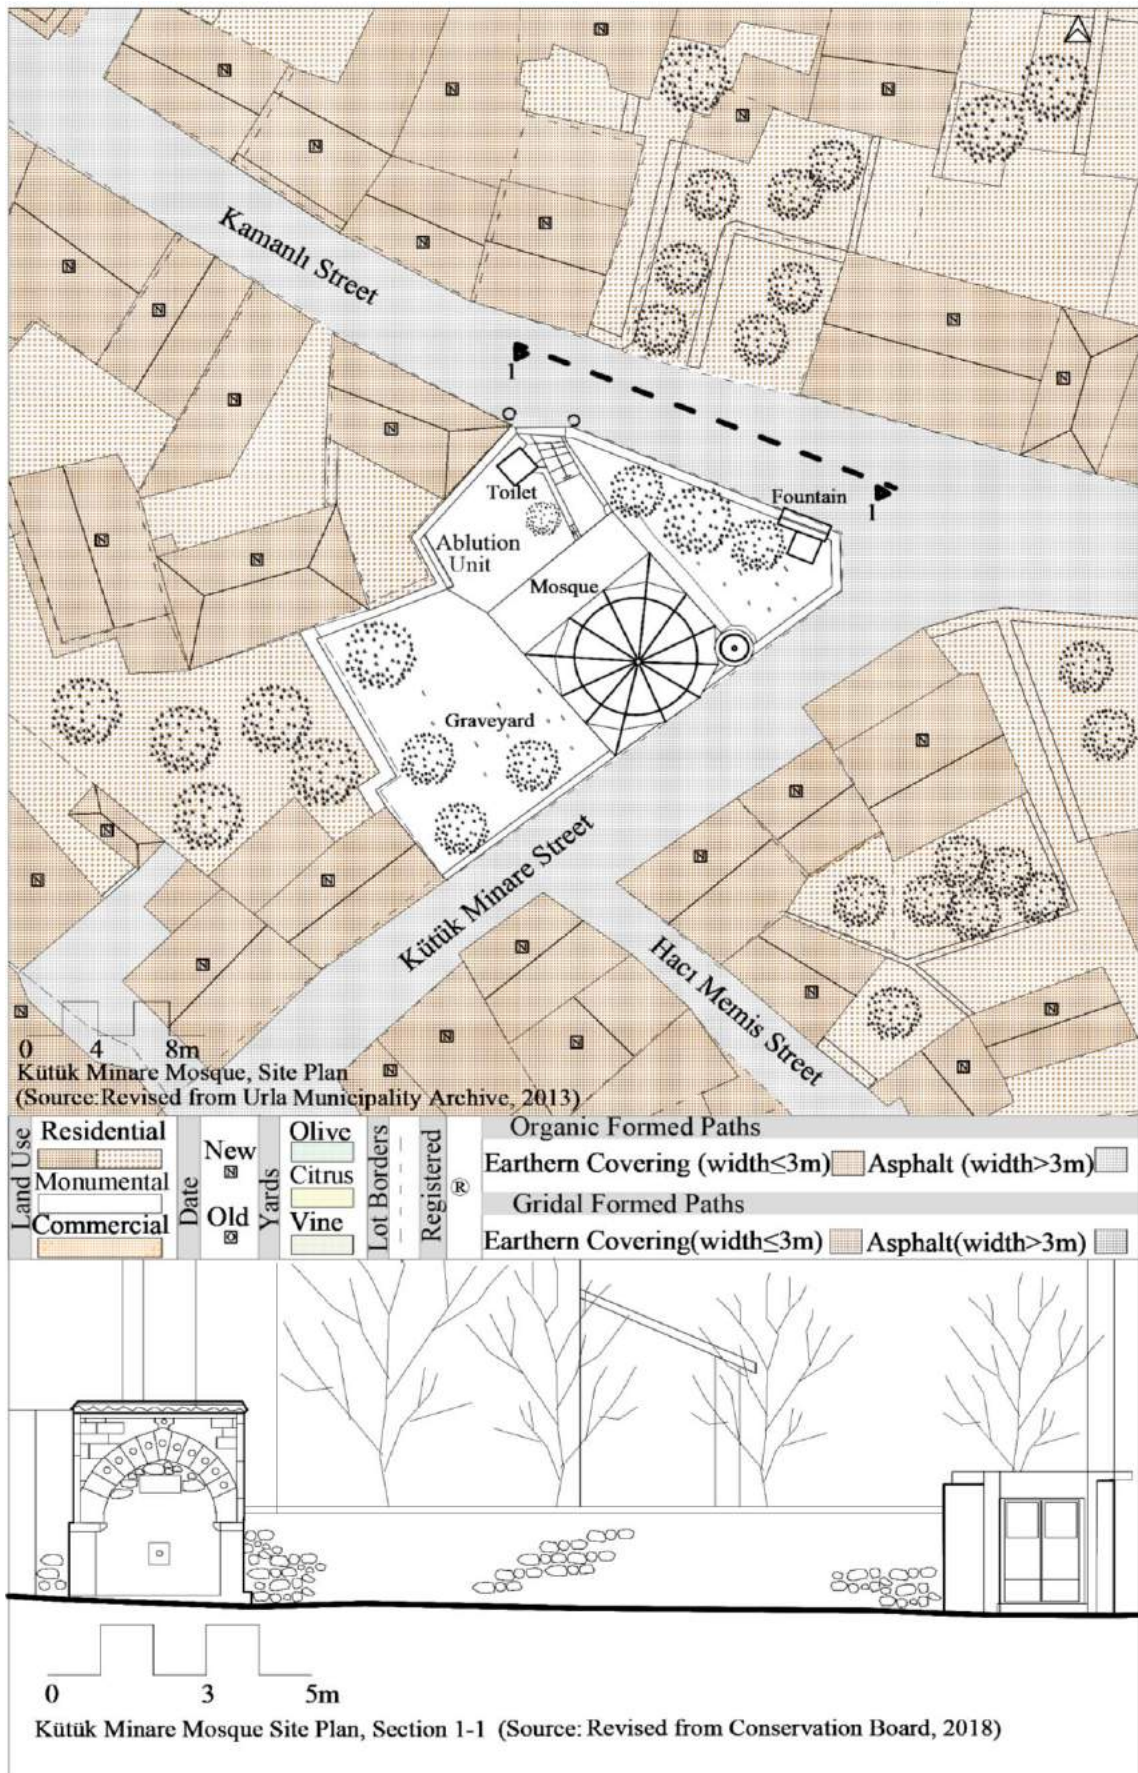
Site plan and silhouette section, Kütük Minare Mosque
